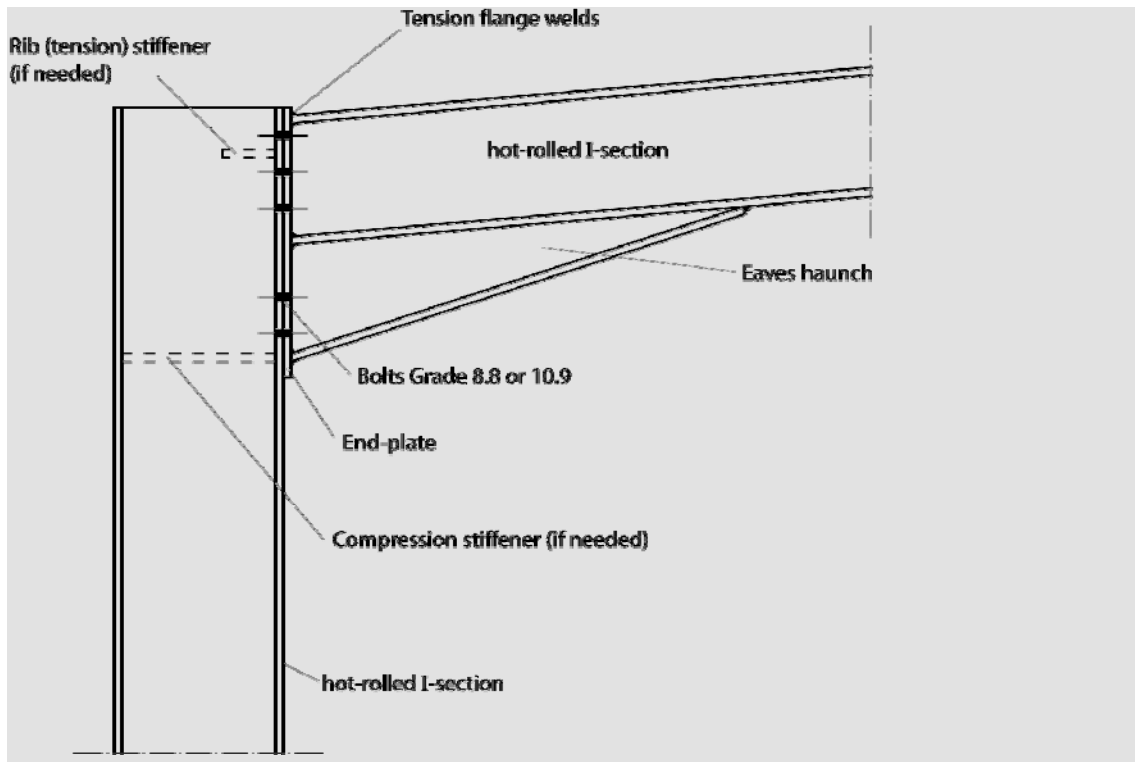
Typical eaves connection in a pitched roof portal frame
